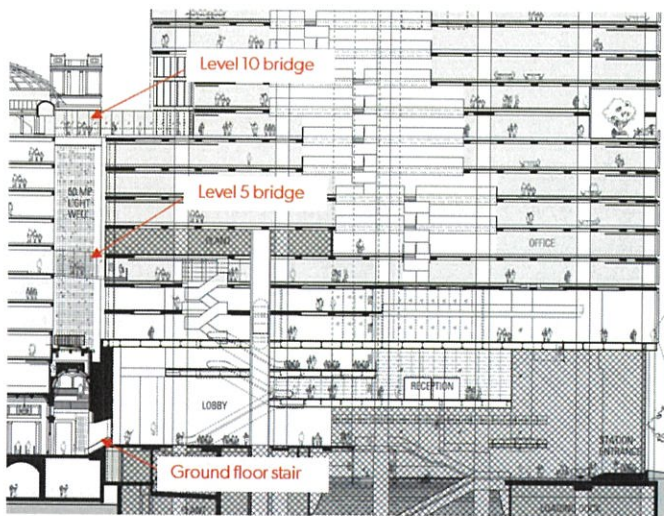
| Section Plan showing proposed works to 50 Martin Place with station entry from Hunter Street shown hatched (Source: Applicant's RtS)
